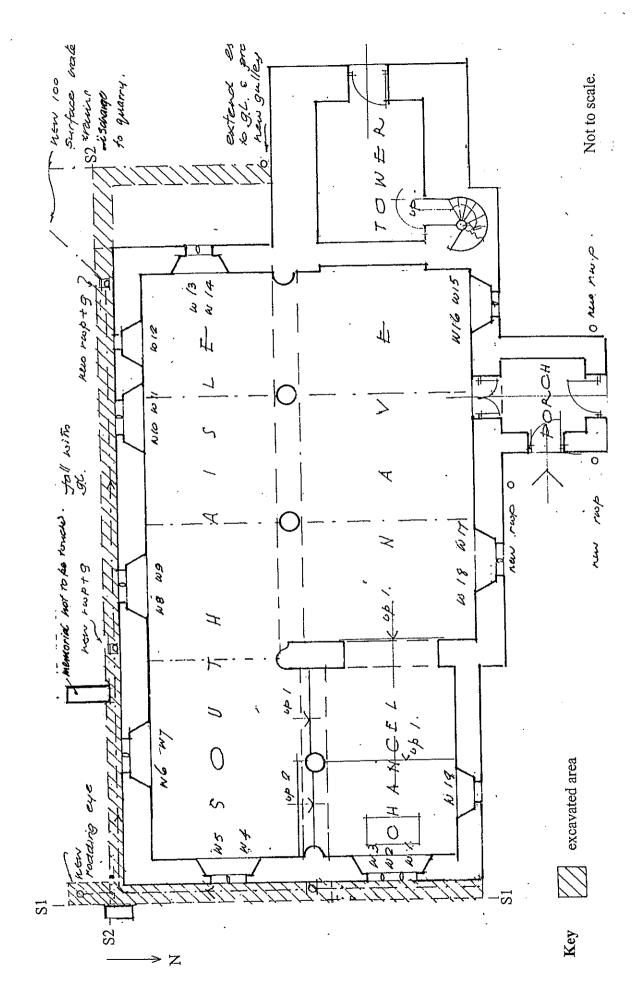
plan of trenches (Courtesy of Wyn Jones, Architect and Historic Buildings Consultant).
